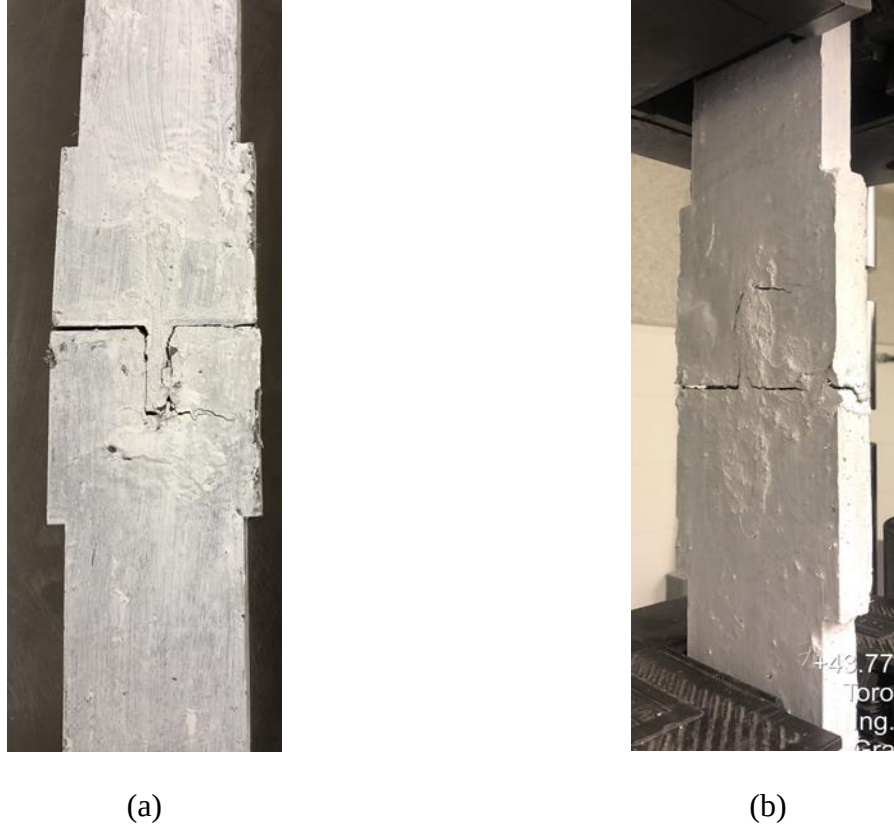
Mild steel key specimen tested under direct tension in MTS machine.
